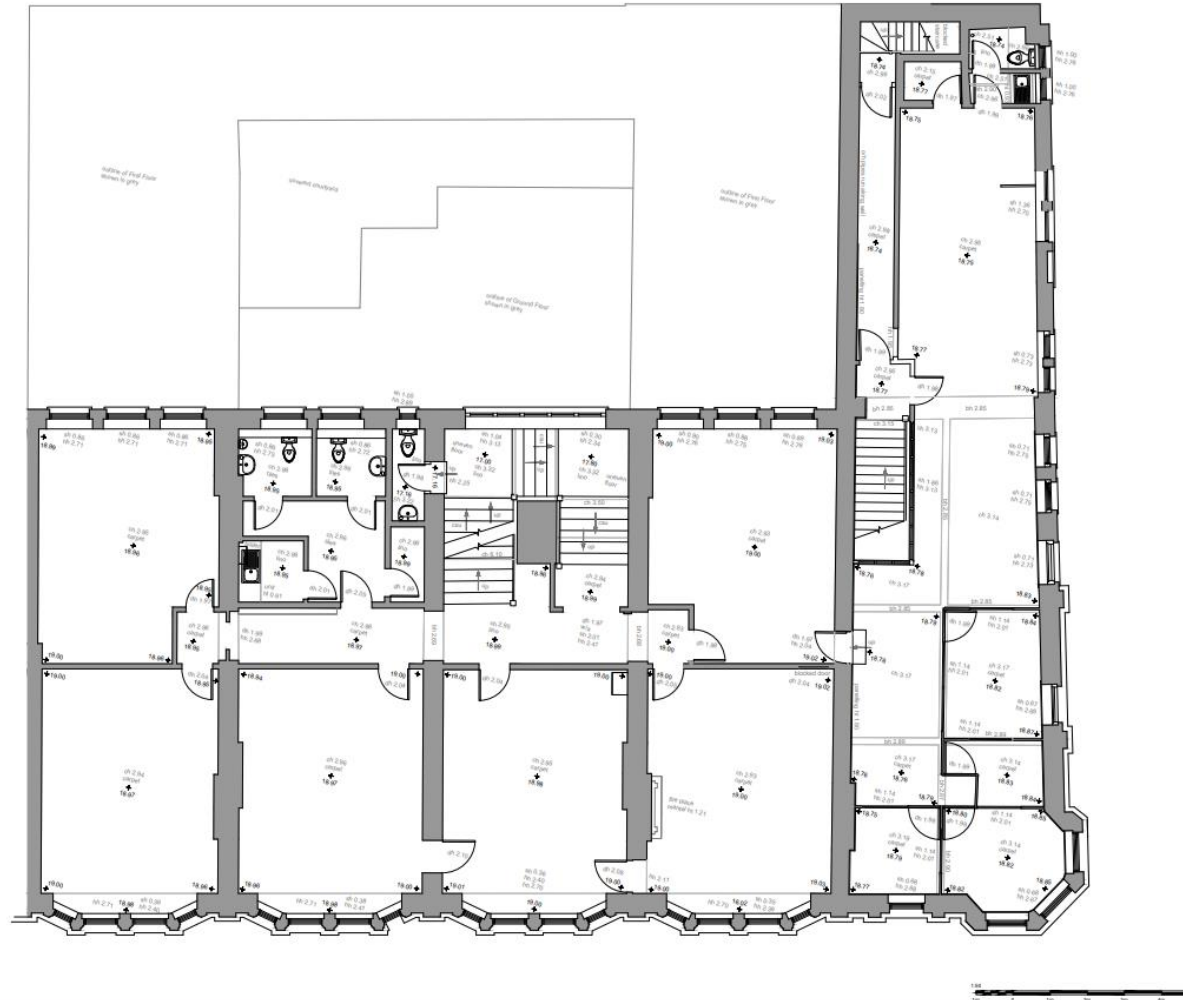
Existing Plan of the Second Floor (reproduced courtesy of the client).
